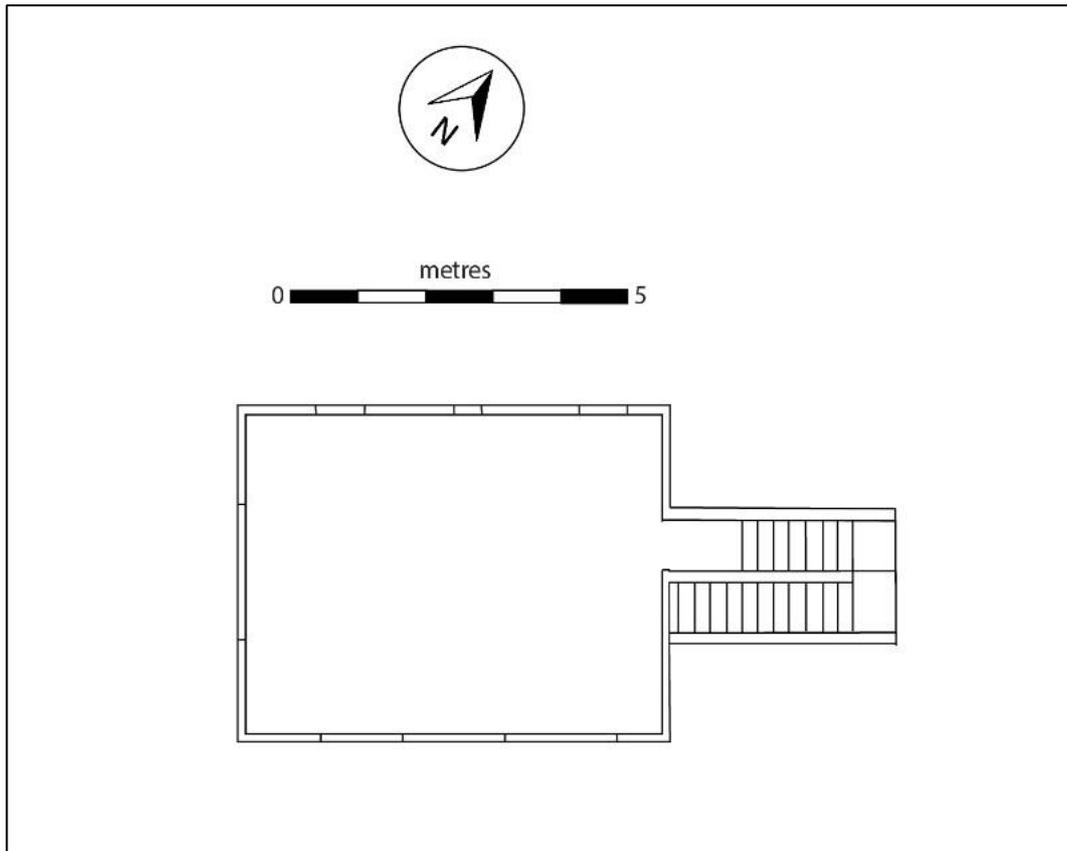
The Floor plan of the Phase 4 upstairs room.
